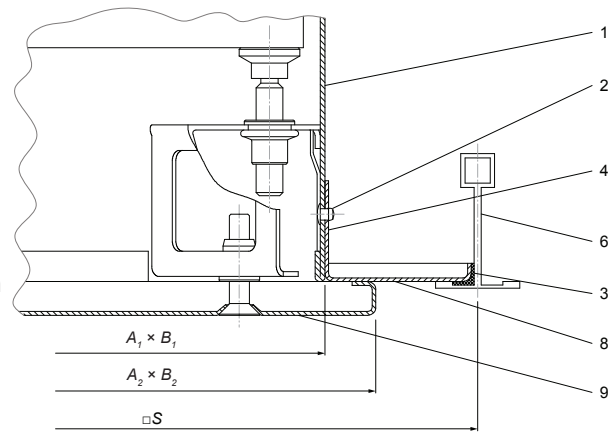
Mounting of the clean filtering cassettes with the type 1 front panel fitting surface into a suspension T-bar ceiling.
